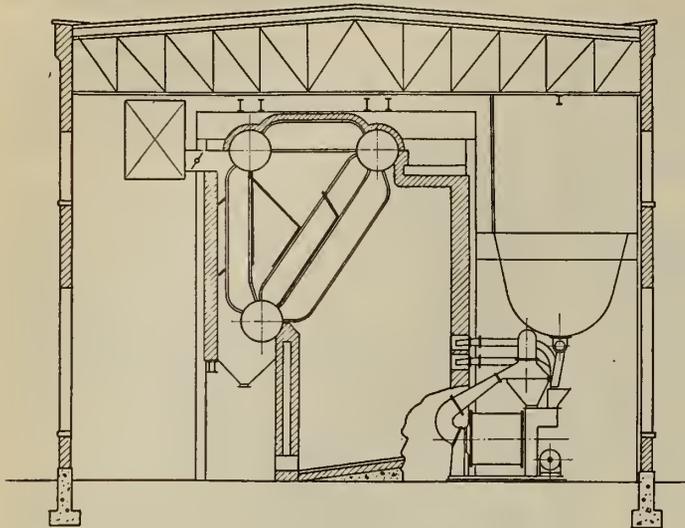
Arrangement of Boiler, Furnace and Unit Pulverizer in the Boiler House of a Canadian Industrial Plant.
